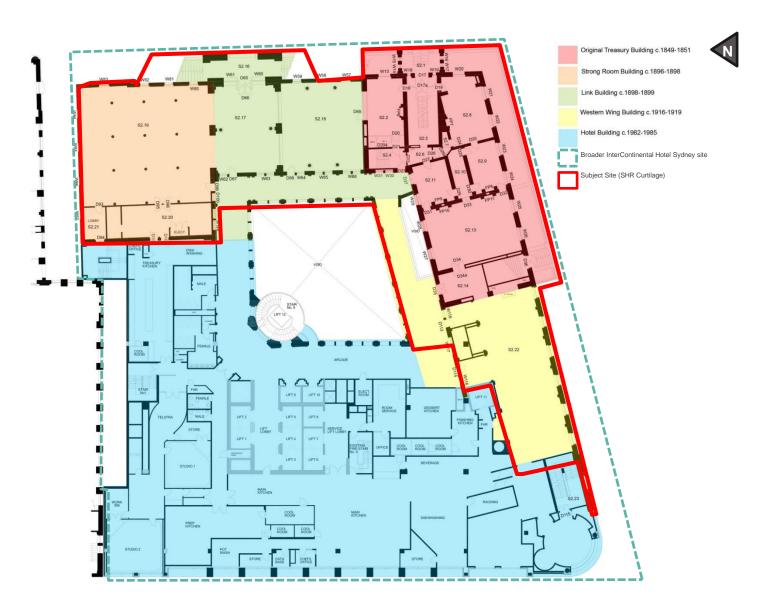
Extract of 'as built' plans showing period of construction – Ground Floor Source: Hassell Architects with Urbis annotations and overlay
